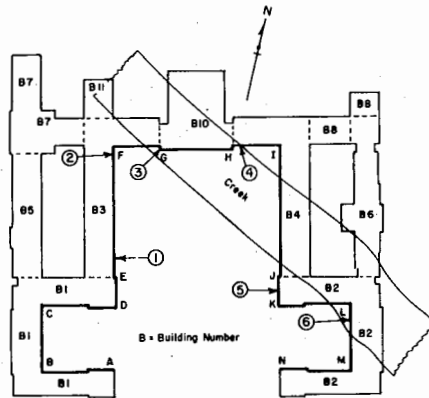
Plan showing location of settlement profile, shown in Figure 20, as bold line, and location of former creek channel.
